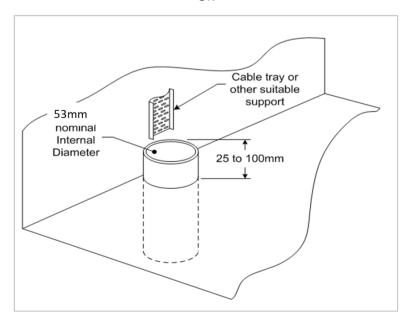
Sleeve example telecommunications riser/closet floor or ceiling entry
